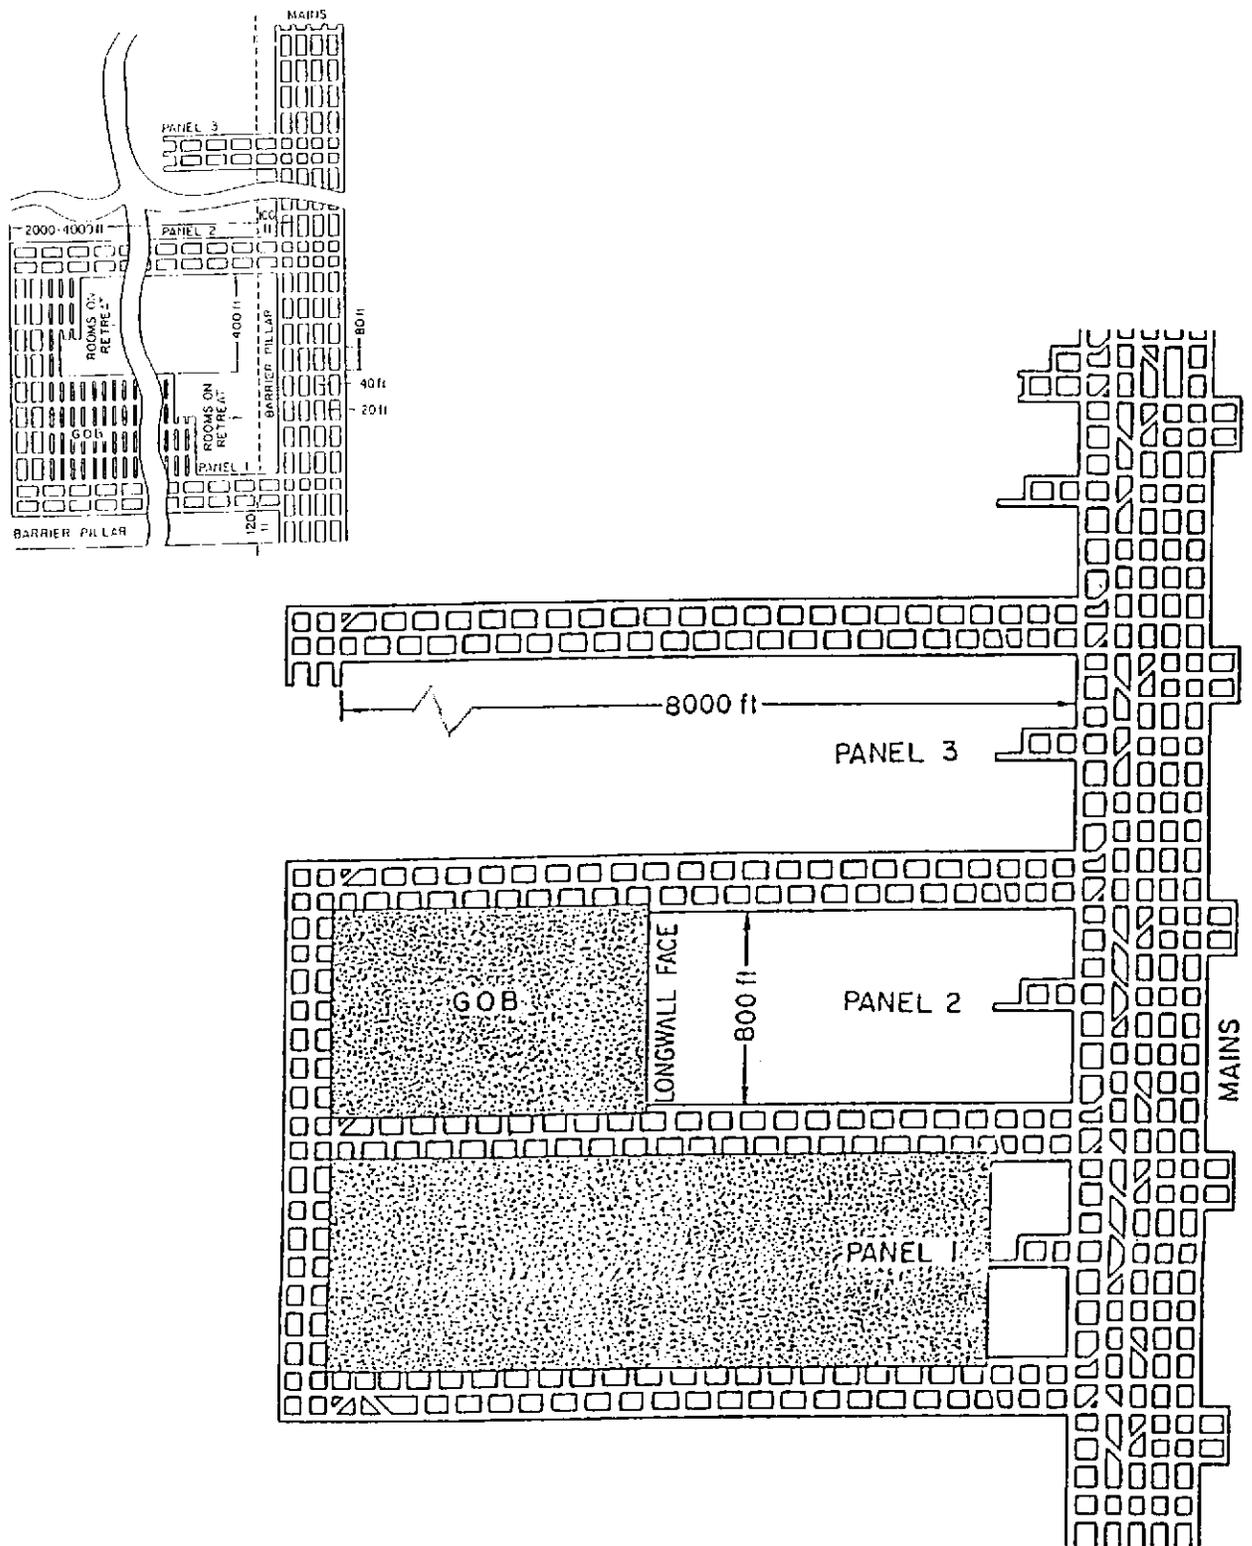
Typical layouts of room-and-pillar (upper left) and longwall mines. These plan views are drawn at the scale of 1 inch equals 800 feet. In the longwall panels, the mine roof collapses to form broad swaths of gob, and the subsidence may extend all the way to the surface. Above the coal support pillars left in the entries between the longwall panels, subsidence is much reduced.
